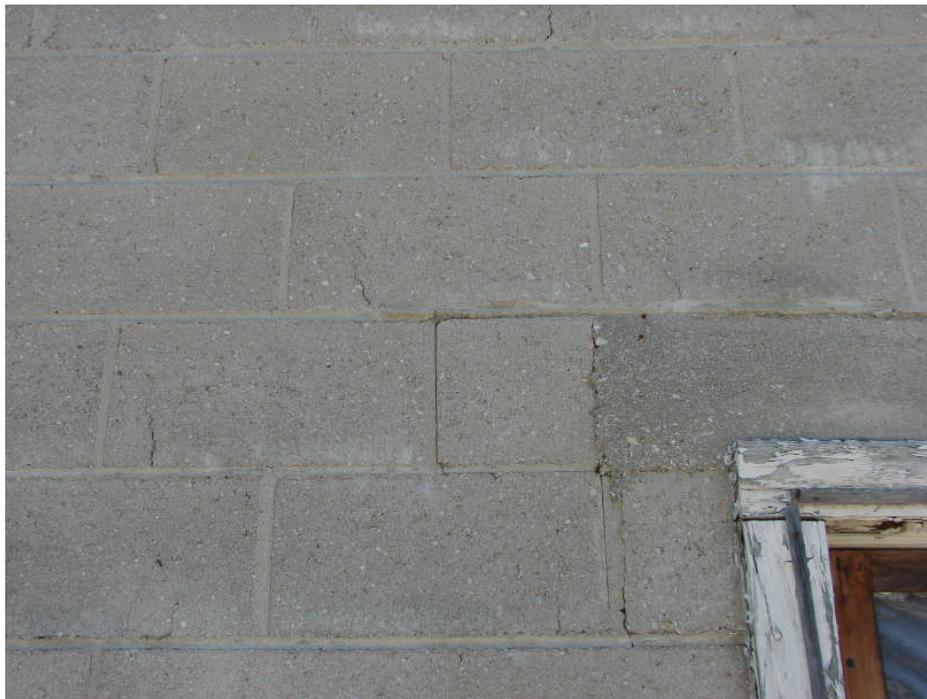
Garage Building west elevation – concrete block wall step cracking at south end, typical.
